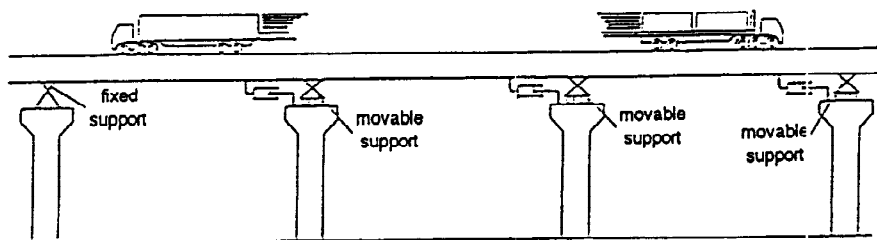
A Continuous Girder Bridge with Load Transmission Devices
